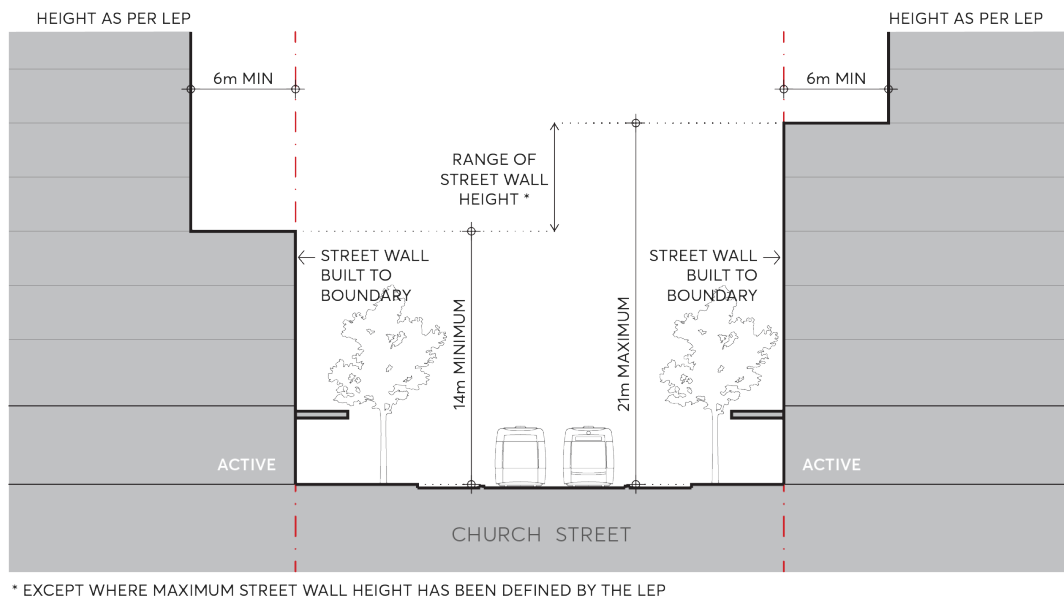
Typical Setbacks and Street Wall Height on Church Street (Section A)
